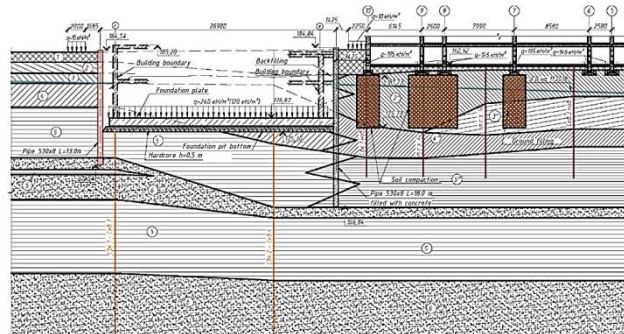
The vertical tie-in of the object under construction and the cementing of the base of existing building No. 1 into the engineering and geological section.
